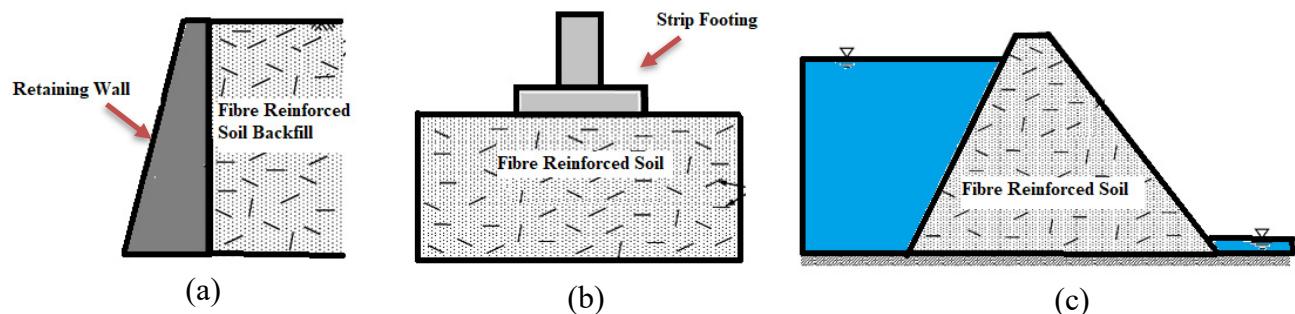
Applications of fibre reinforced soil: (a) A retaining wall, (b) A strip footing, (c) A check dam (small dam constructed across a drainage ditch, swale, or channel to lower the velocity of flow) modified from [26].
